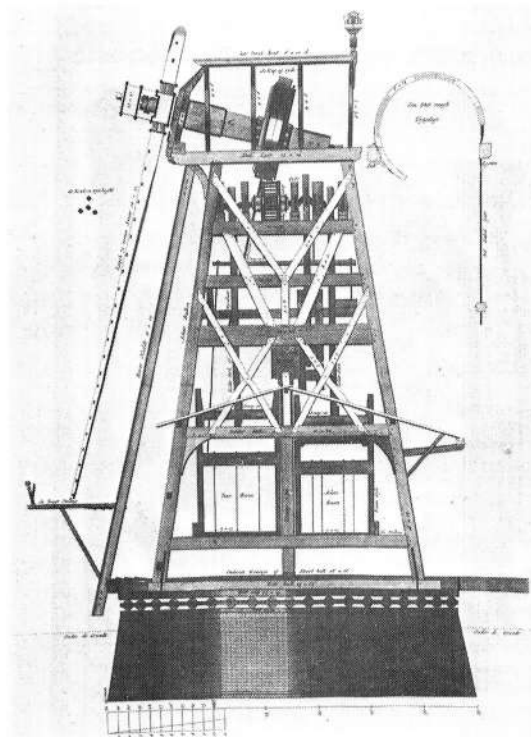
Early eighteenth century Dutch sawmill, or paltrok, mounted on large roller thrust ring containing trunnion-mounted, wooden rollers having lengths and diameters of about 180 mm (7 in.).
